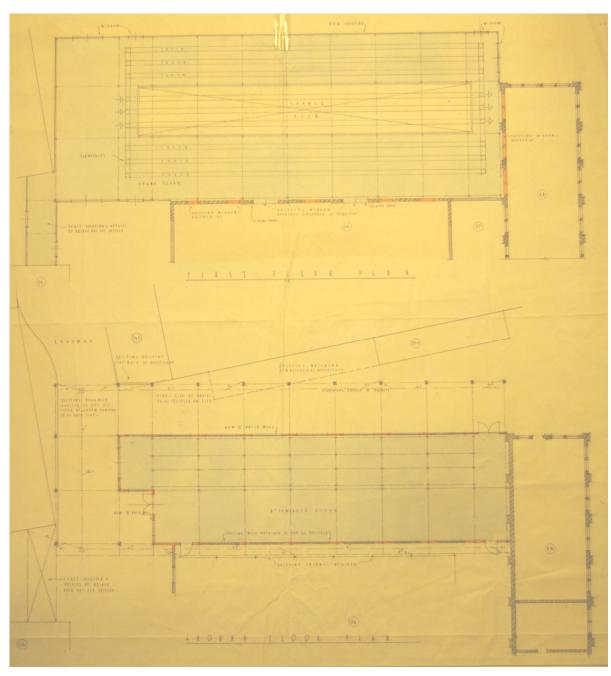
Building T as planned for redevelopment in March 1947. Top: the extent of the proposed new area. Bottom: the existing kiln area. The rectangular area to the right is Building R (source: Worcester Porcelain Museum).
